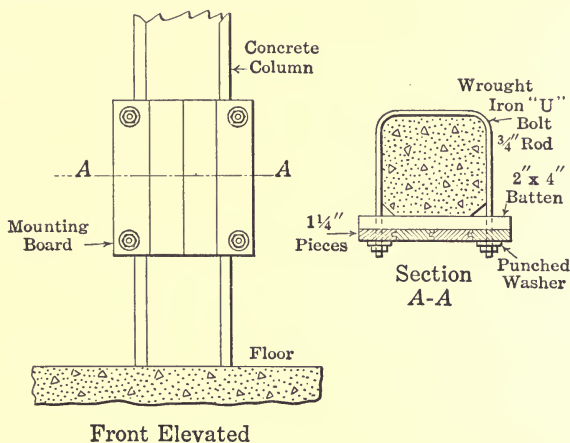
MOUNTING BOARD FOR REINFORCED CONCRETE COLUMN.
